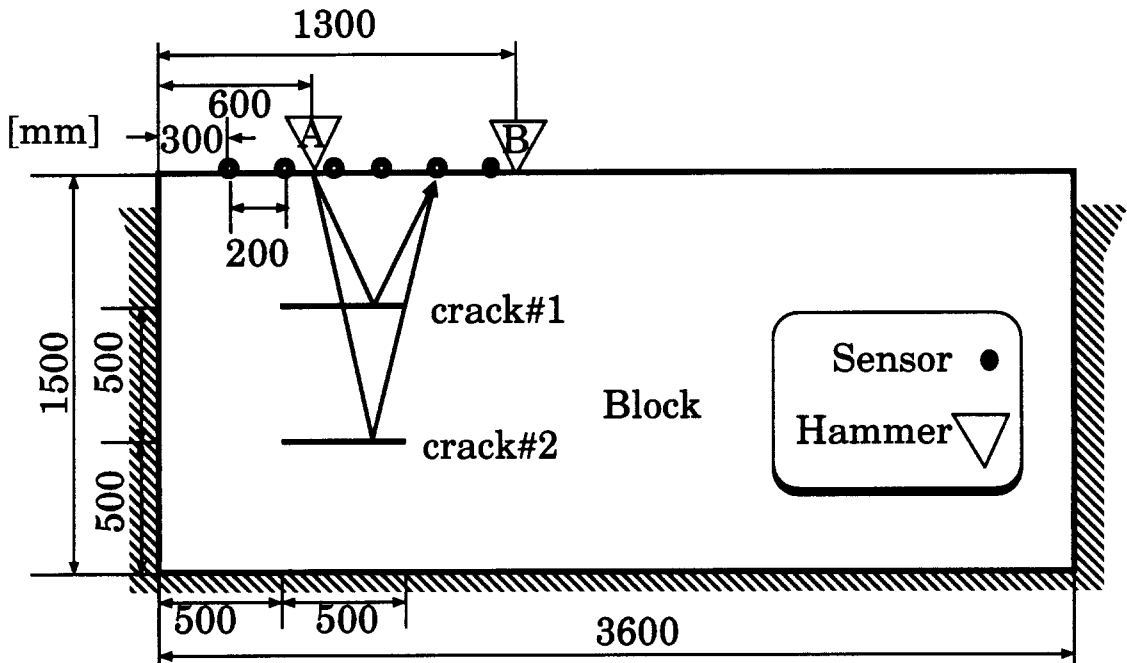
Pick-ups and a concrete block with a crack.
